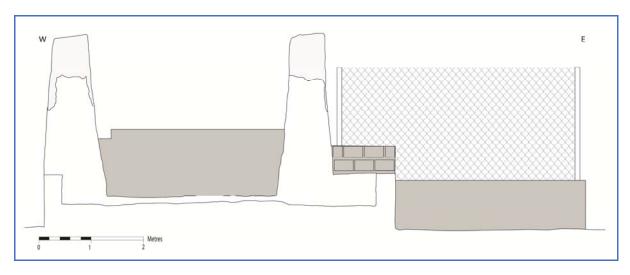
Elevation of the south facing side of the well superstructure and trough.
